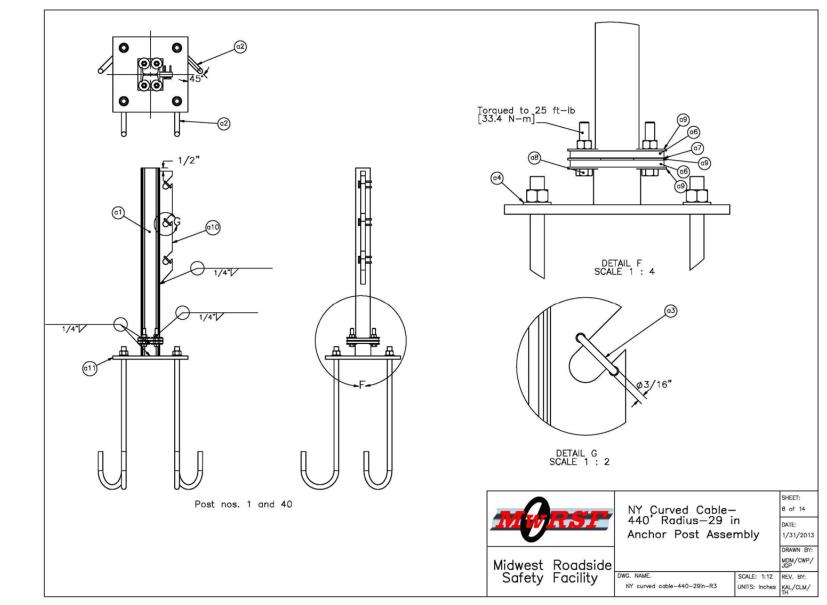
Anchor Post Assembly Details, Test No. NYCC-3
